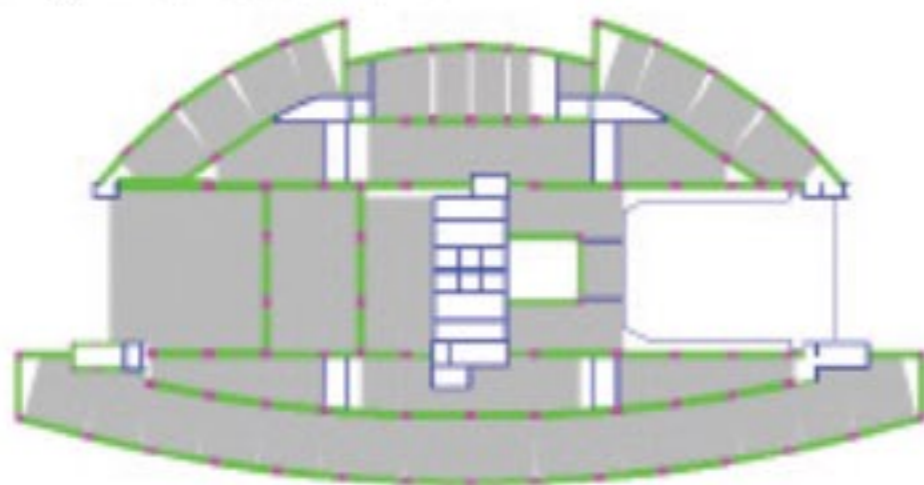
Freedom in design of the floor layout of the conference building of the European Union, Brussels, with its 7 large conference rooms
